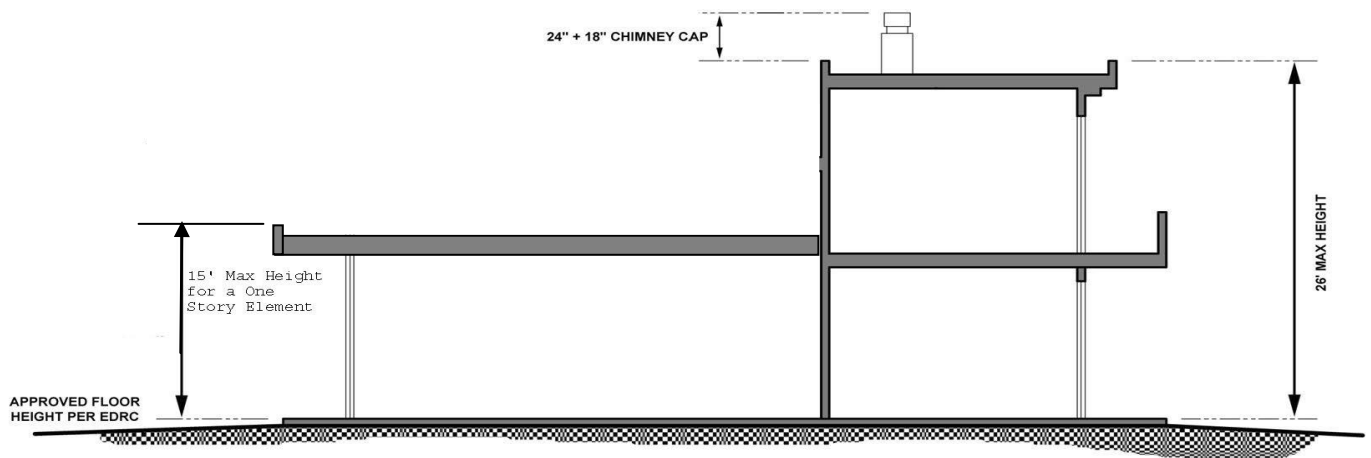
MAXIMUM BUILDING HEIGHT
